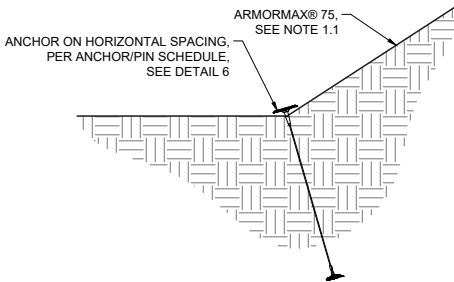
INITIAL CHANNEL (IC) TRENCH (DOWNSTREAM)
